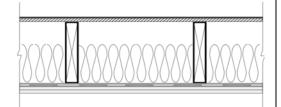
Sketch of section of the raised heel wood-truss roof construction in the test frame intended to represent half of a typical roof structure. The trusses were constructed of 2" by 4" lumber (38 mm by 89 mm) and with a 4 in 12 slope.
